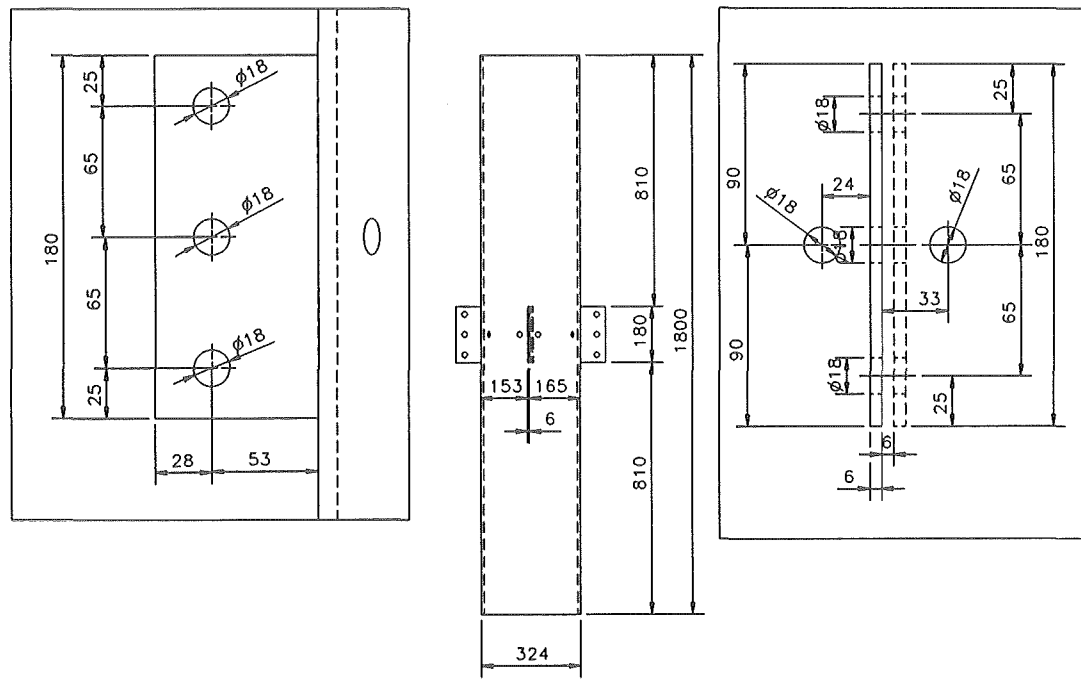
Web plate welded to columns (typical) for specimens 4C1 to 4C4
